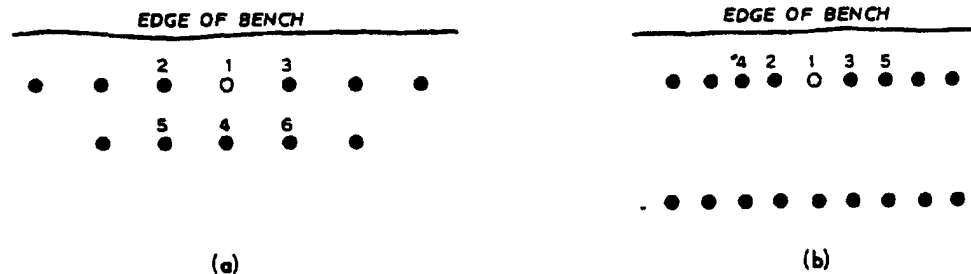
Plan of coyote layout with detonating cord (after Du Pont<sup>8</sup>)
